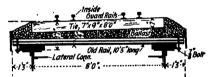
Bridge Floor of Old Rails; Chesapeake & Ohio Ry.
